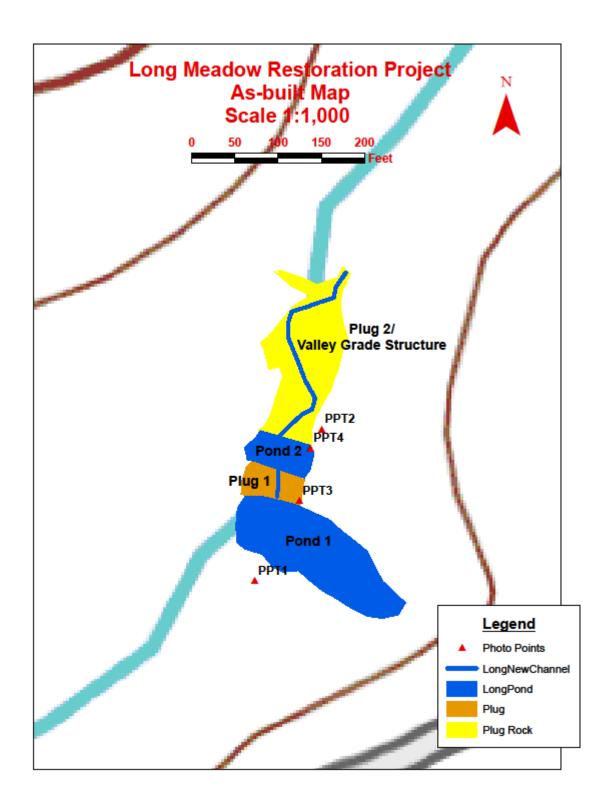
The as built design showing ponds, plugs and valley grade control. The stream structure was built in. This Figure also shows locations of Photo-Points.
